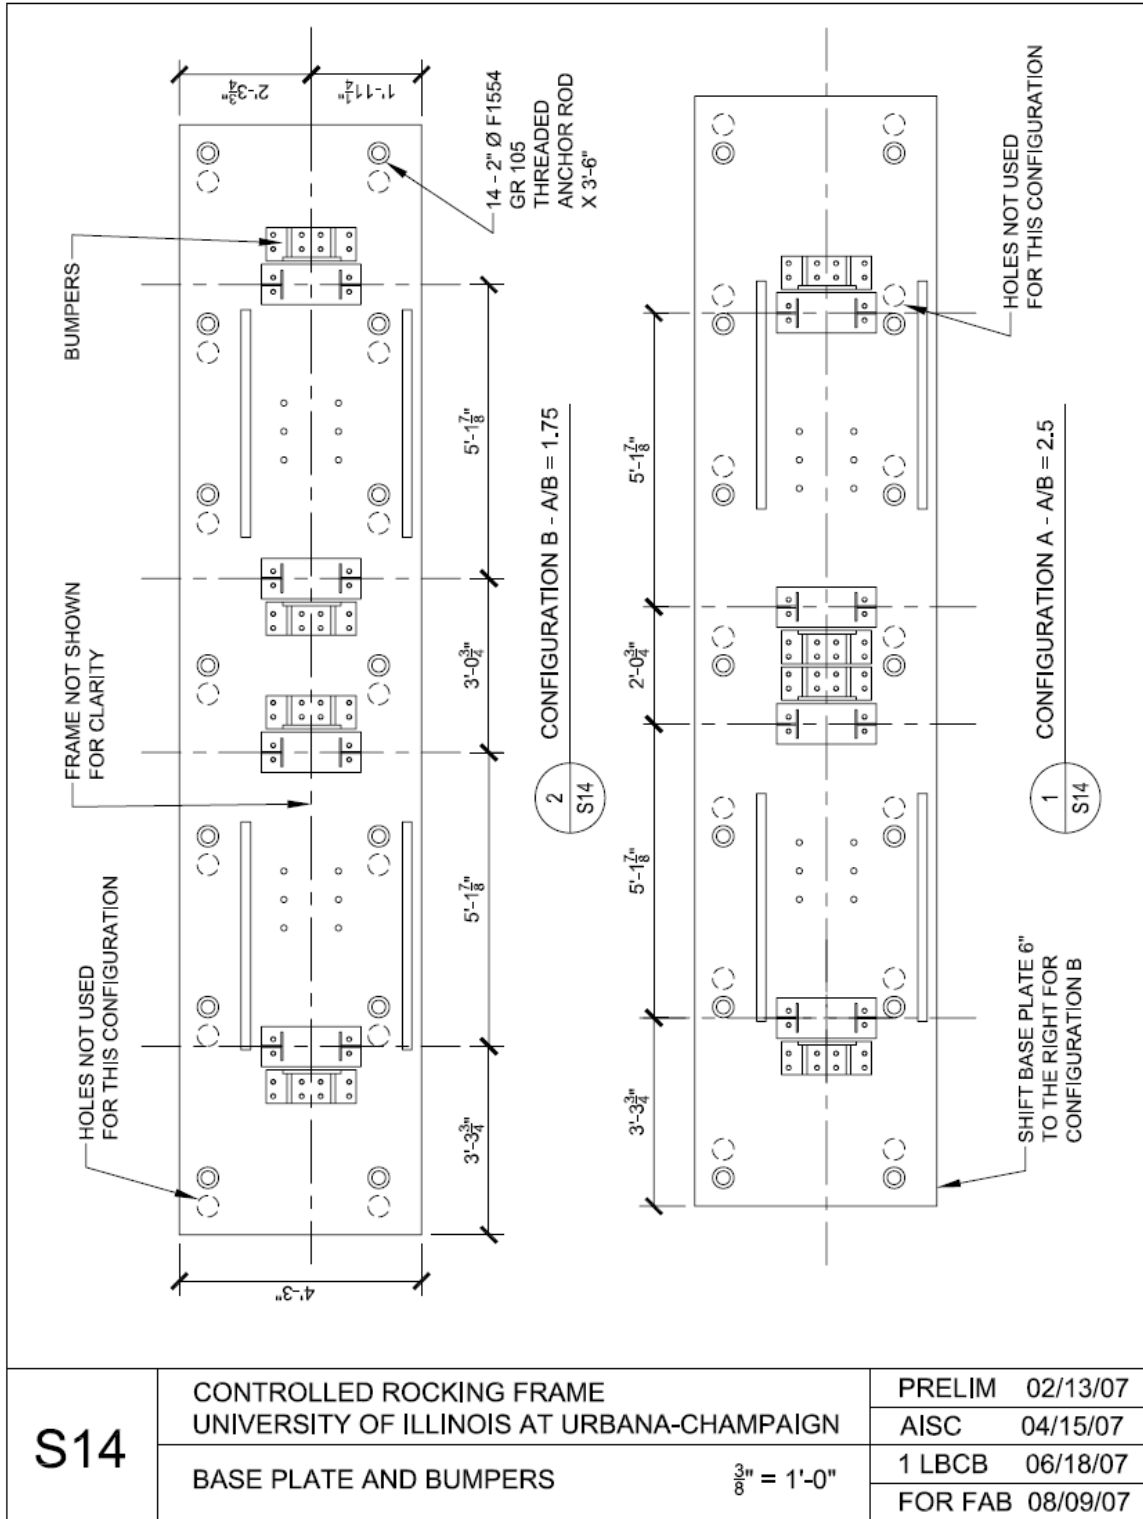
Specimen Design Drawing – Base Plate and Bumpers
